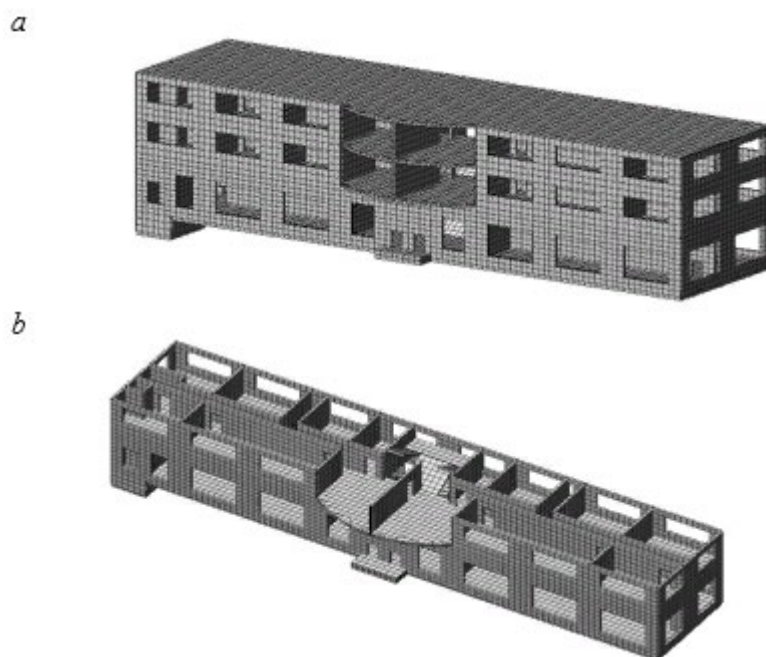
A finite element model of the buildings under study with a wall structural system (a) and a section of the model on the second floor (b).
